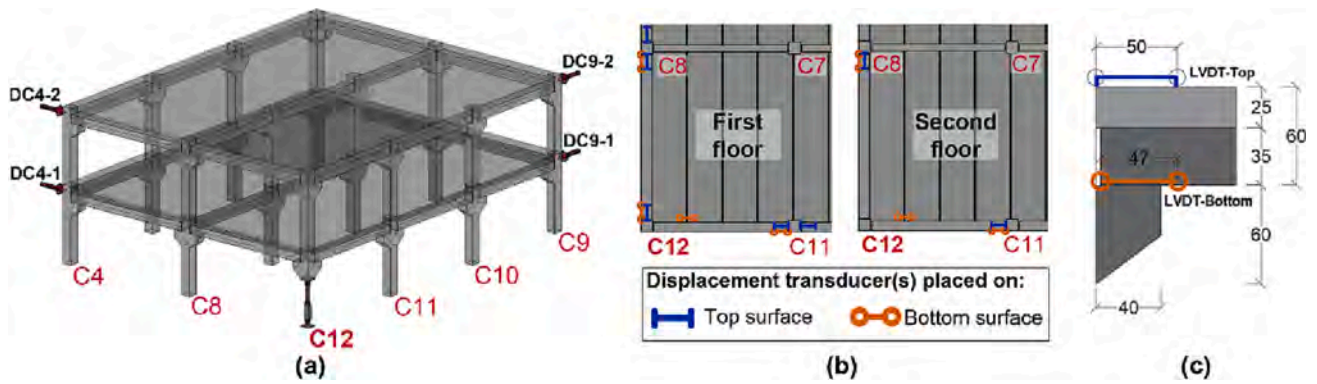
(a) Locations of displacement transducers monitoring horizontal building drift; (b) Displacement transducers monitoring horizontal extension or contraction at the top or bottom of beam-column joints or below the slab between hollow-core planks; (c) Schematic showing the positioning of displacement transducers at the top and bottom of a beam-column joint (all dimensions shown in cm).
